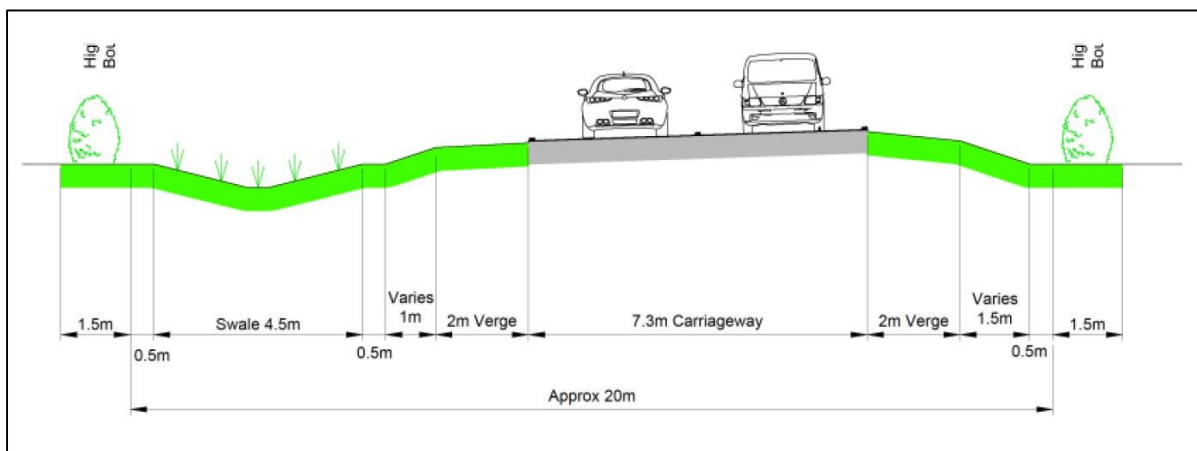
Typical cross section (illustrative) for the new Newgate Lane South route
